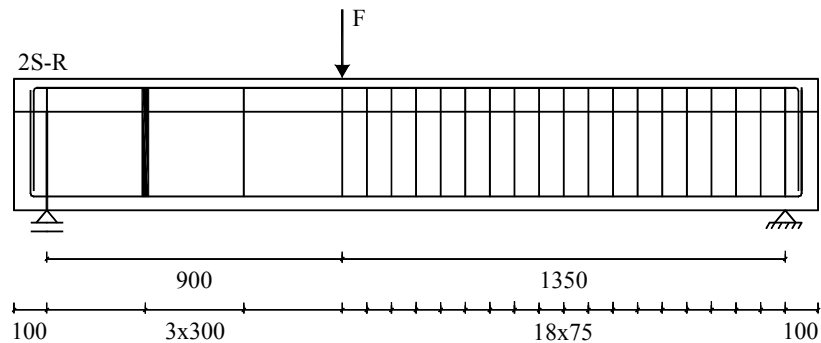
2S-R reinforced concrete T cross section beam [dimensions in mm] (Dias and Barros 2010).
